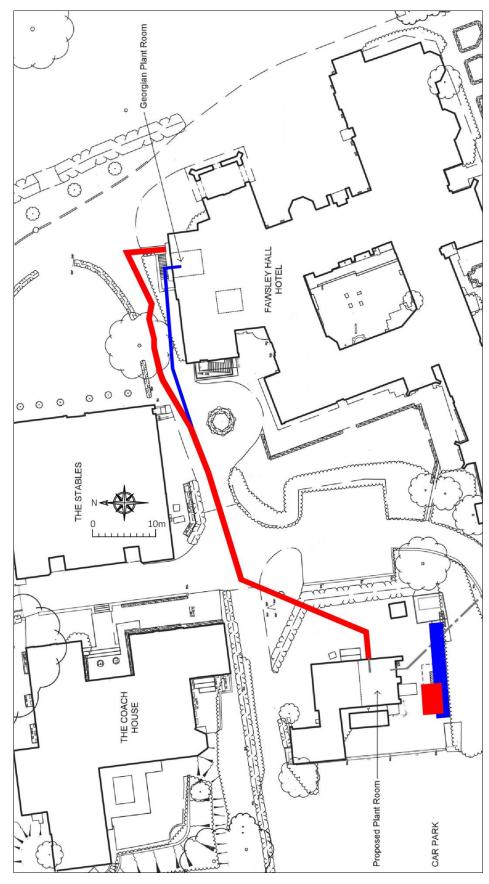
Trench location plan (Blue areas indicate proposed location, red areas indicate actual location) (scale 1:600)
